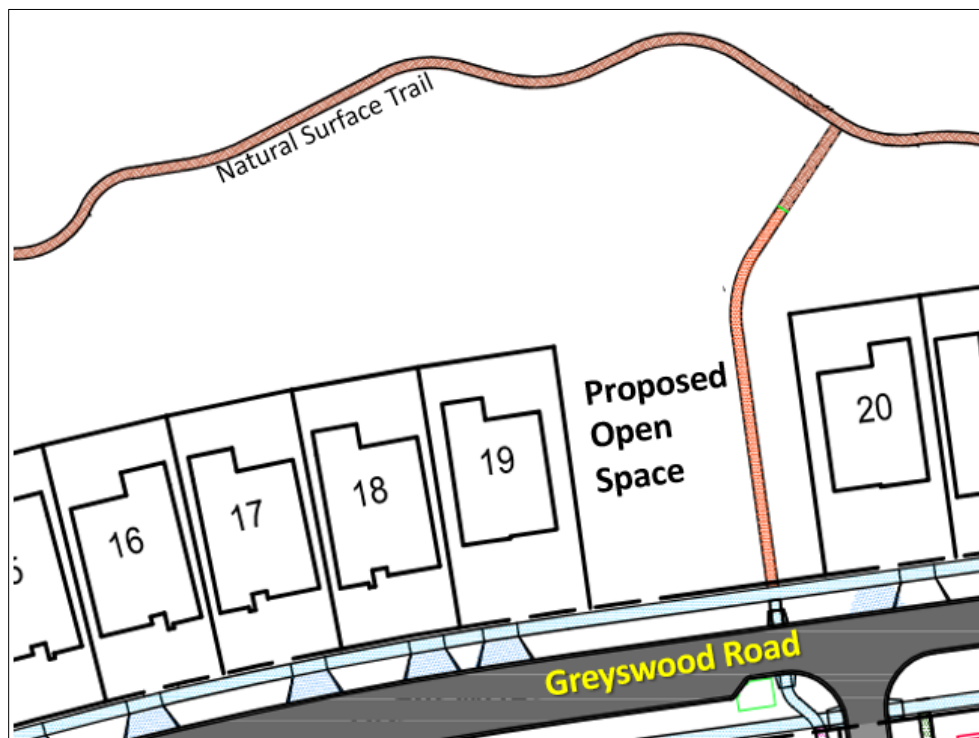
Proposed Lot Layout and Open Space along Greyswood Road
